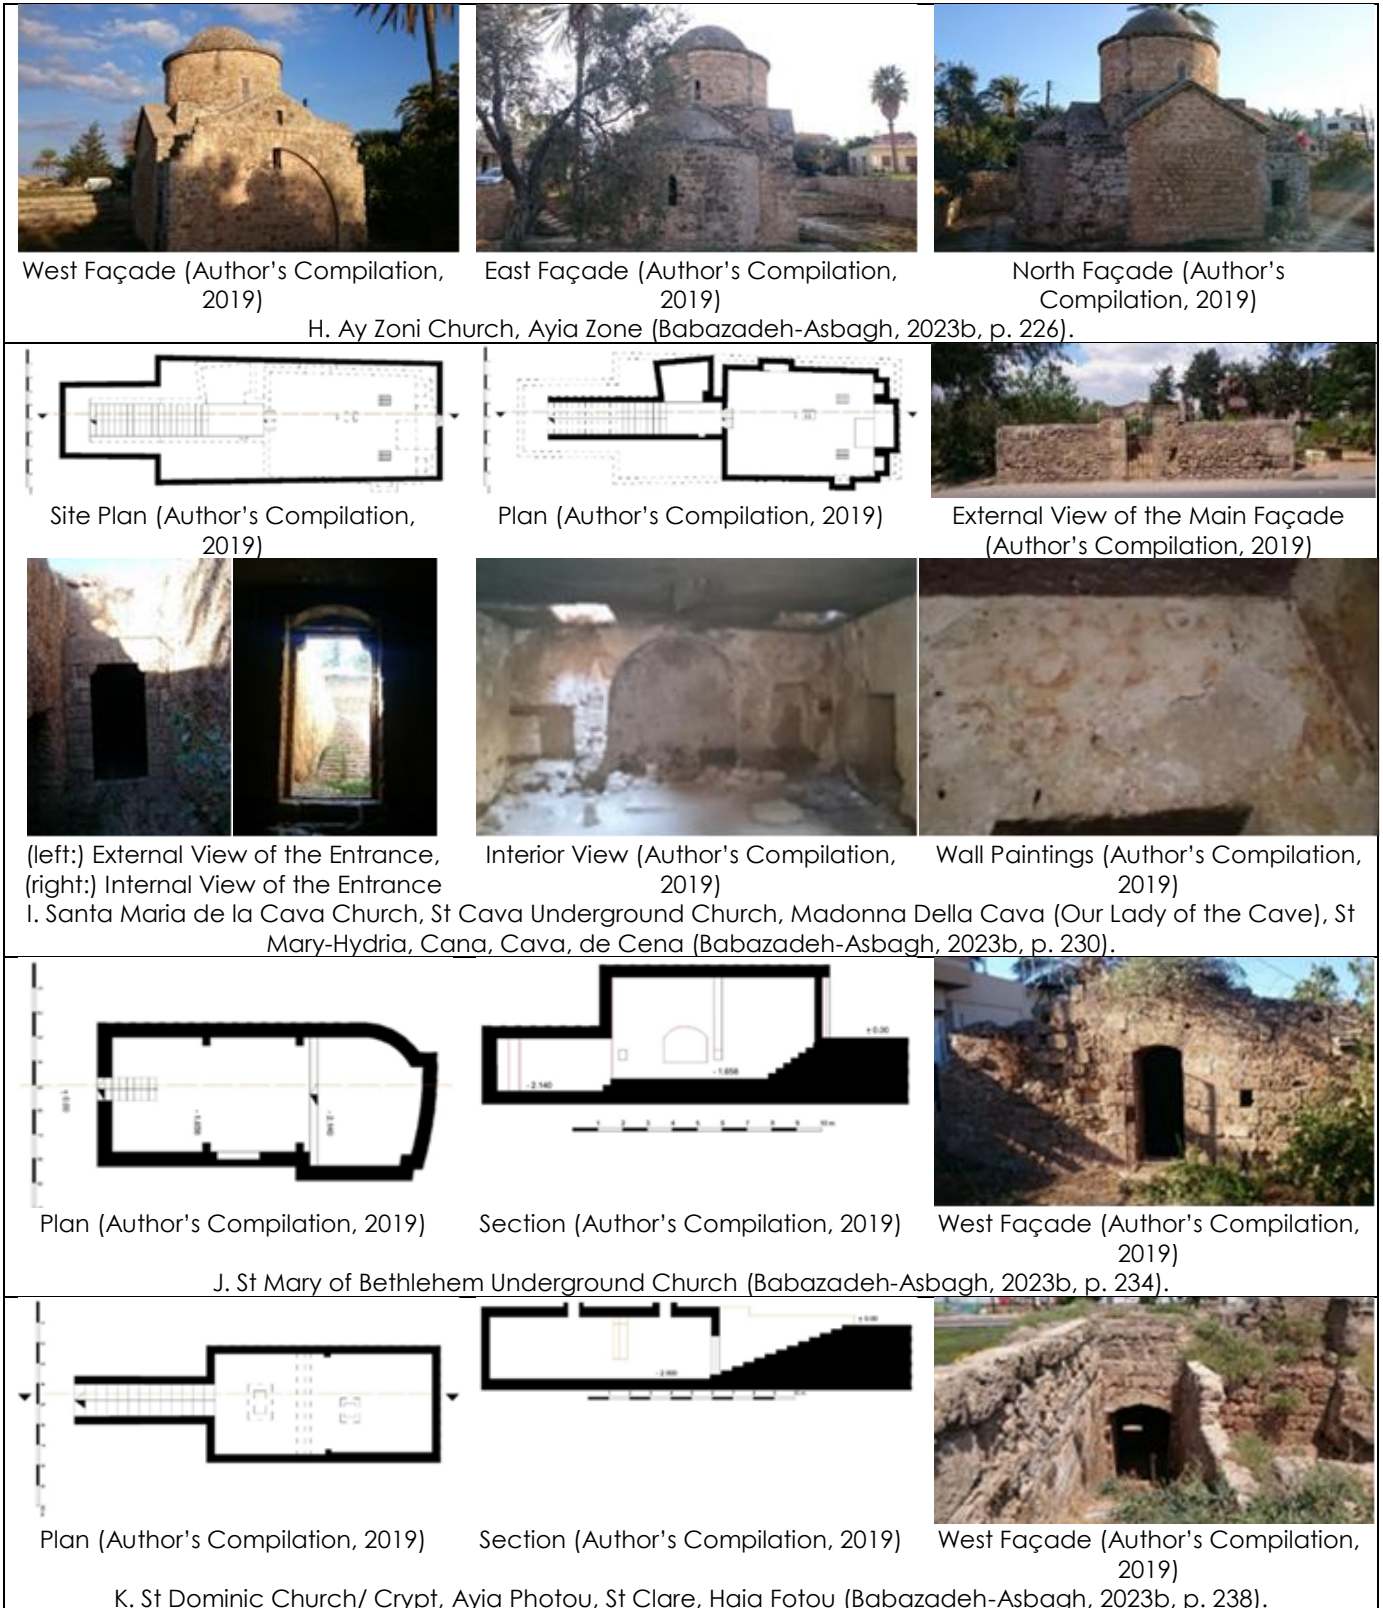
Plans, Sections, Façades, and Pictures of the Churches in the Walled City of Famagusta.
